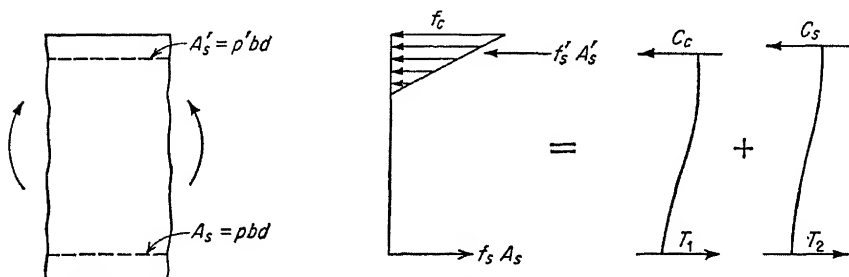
Internal forces for doubly reinforced concrete flexural element.
